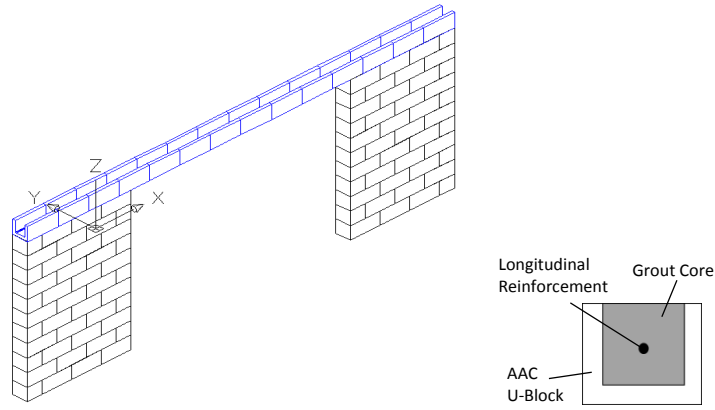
a) Lintel spanning opening prior to grouting b) Lintel cross-section
